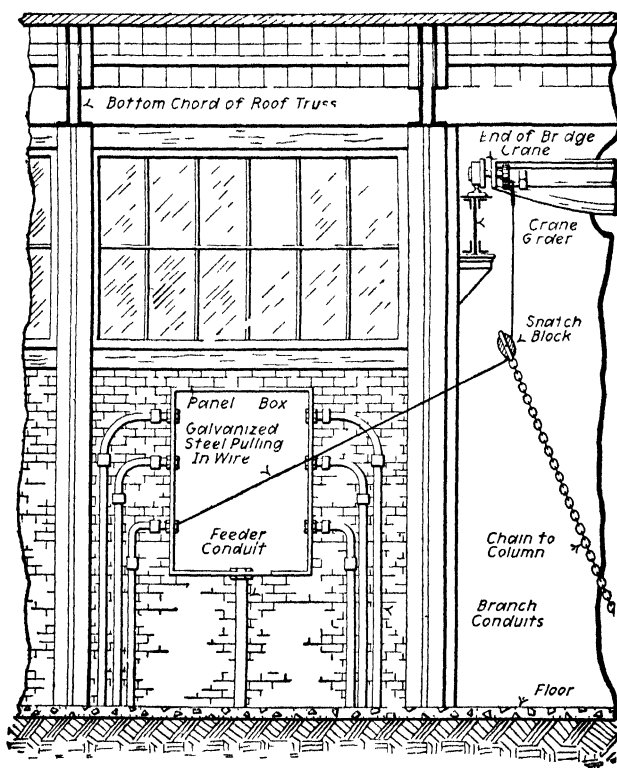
A pull "around a corner." (The plan view of this arrangement is shown in the next illustration)
